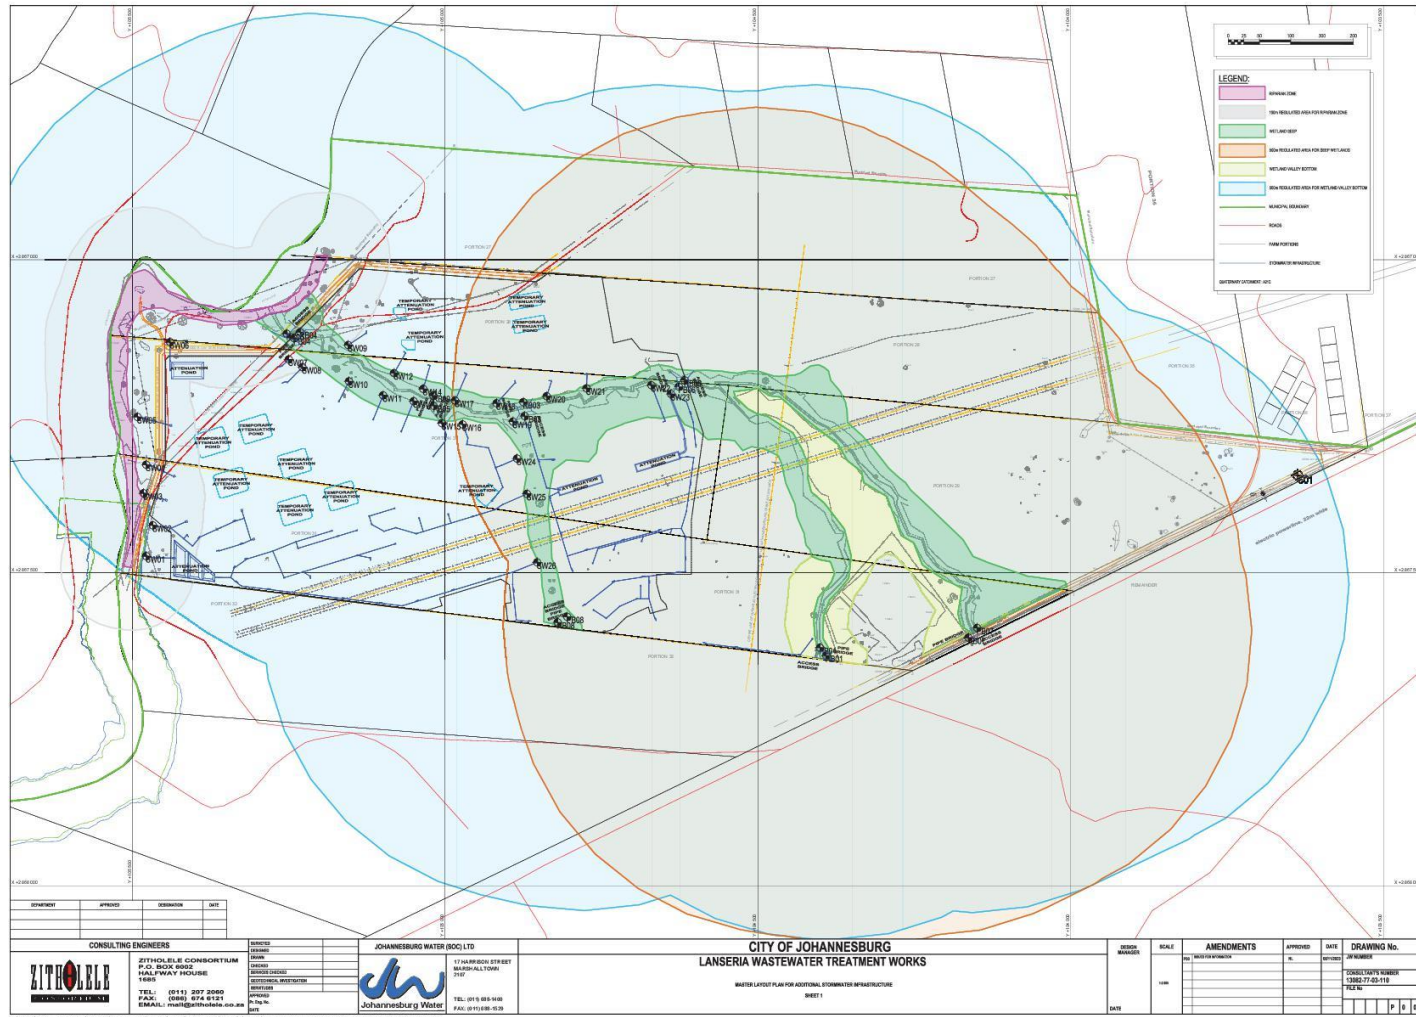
Master layout Plan for Proposed Additional Stormwater Infrastructure at proposed Lanseria WwTW
